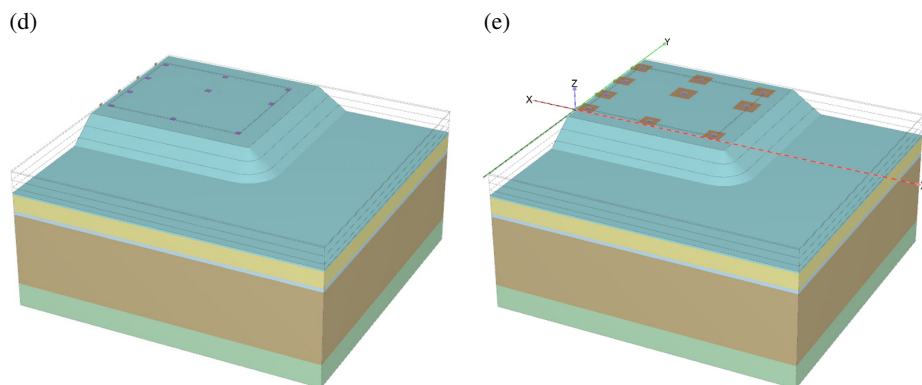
[cont.] Model construction phases: (d) Building the foundations and third part of embankment (4.8 m high), (e) Consolidation calculation until the minimum excess pore achieved
